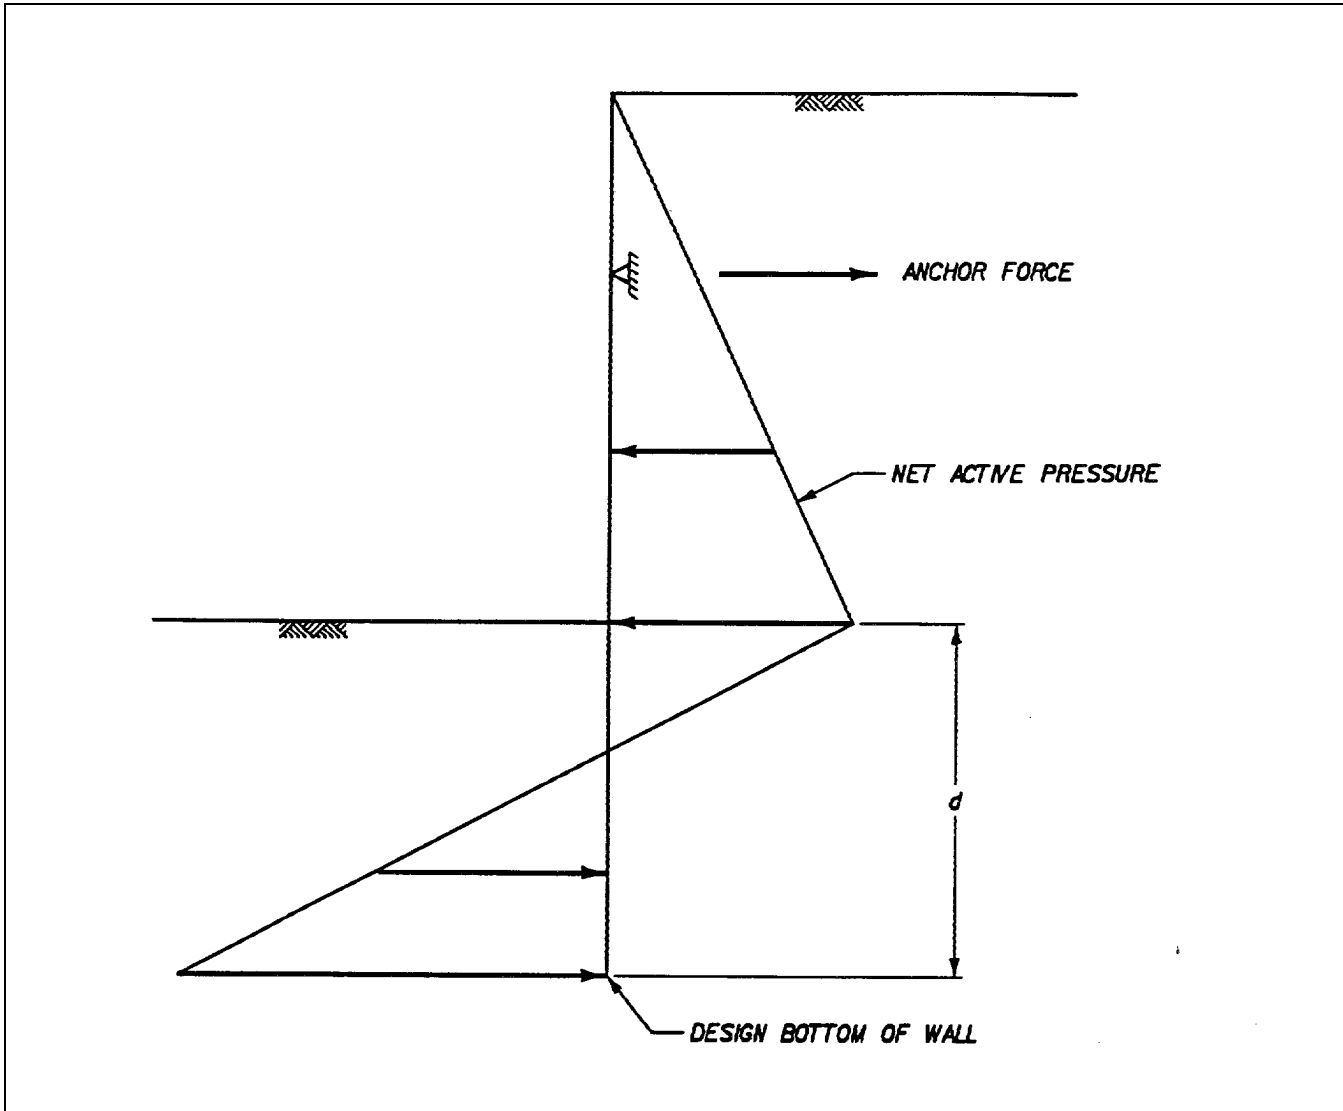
Design pressure distribution for free earth design of anchored walls
